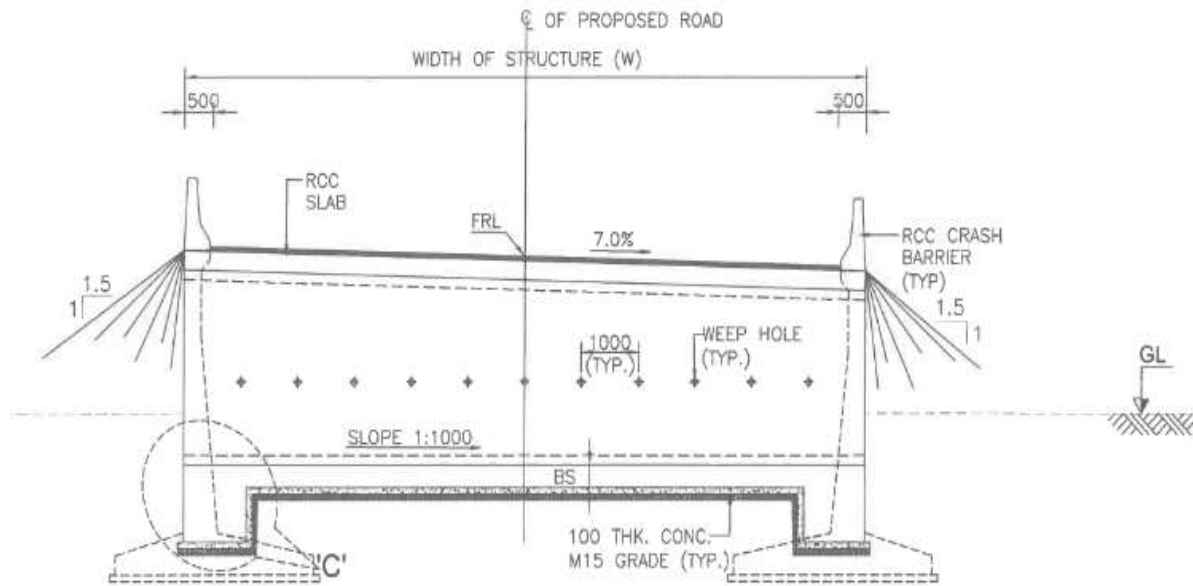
Cross section of culvert across road at chainage 38.340 km. (Source: NHIDCL, PMU-Kalimpong)
